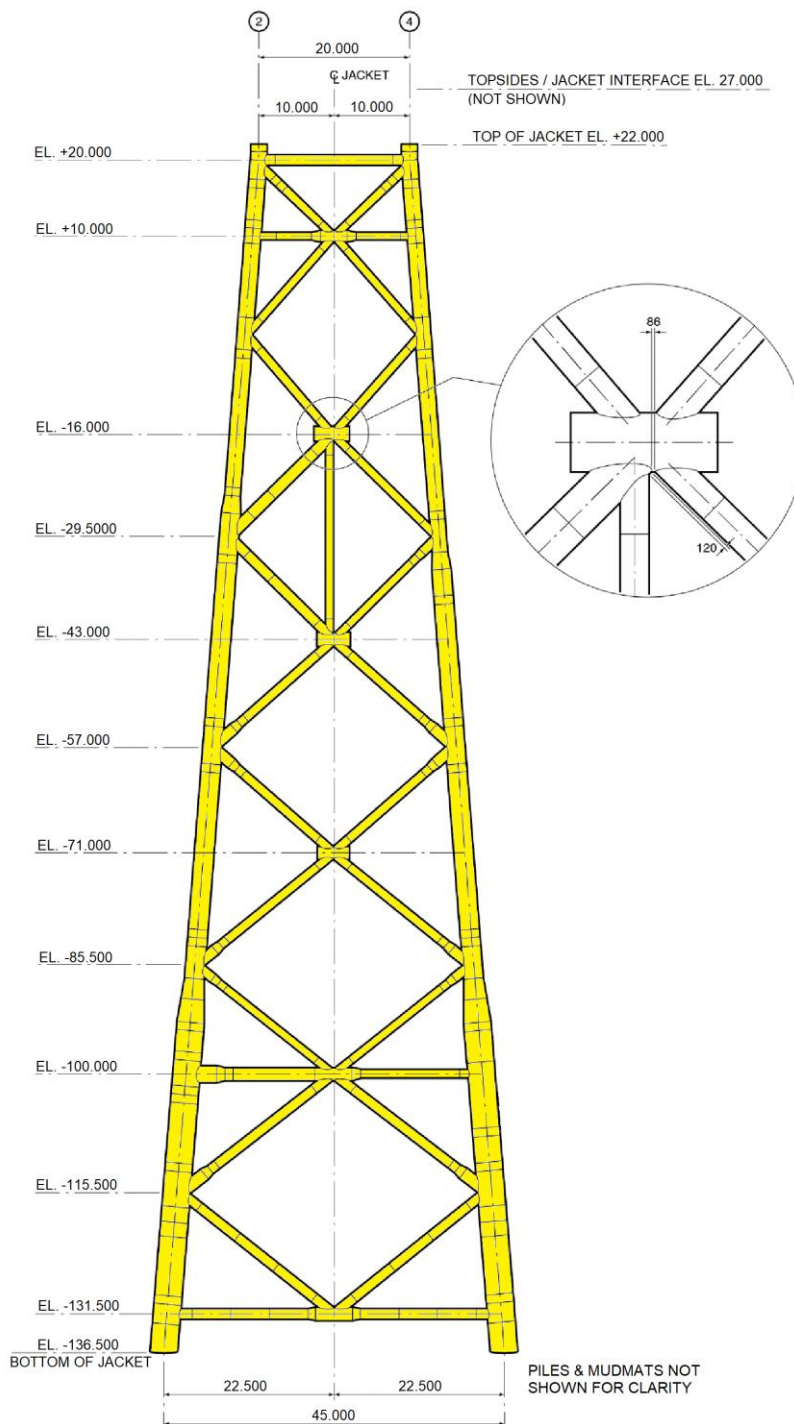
Solan jacket elevation on row 'A' (rows 'B', '2' & '4' similar)
